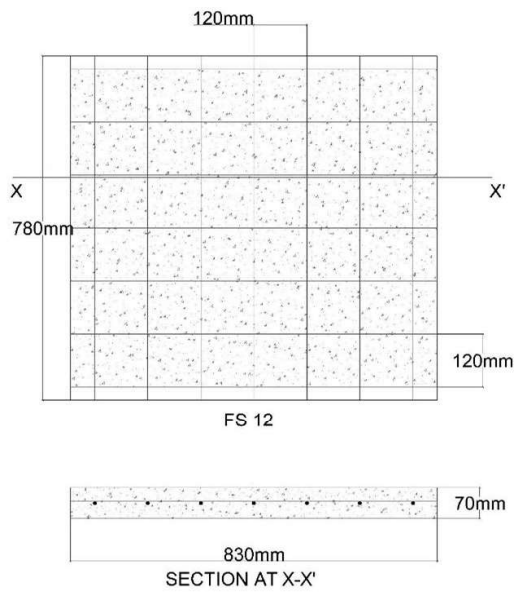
Reinforcement Details of 120 mm spacing specimen
